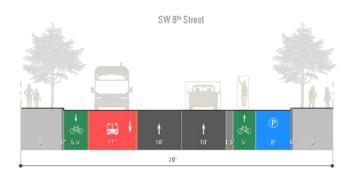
Build Scenario 1 (2 lanes + Transit Alternative 3) Typical Section
